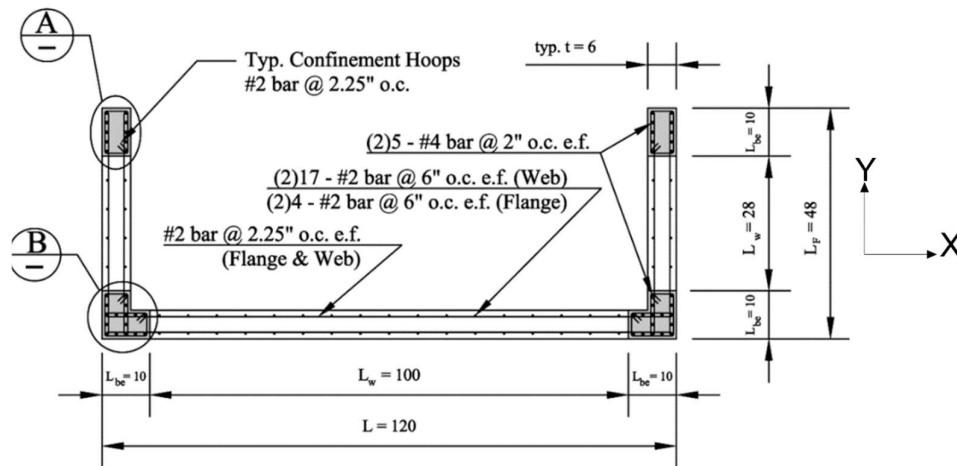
Cross section of the test specimen CW1,CW2,CW3 scale 1:3.
